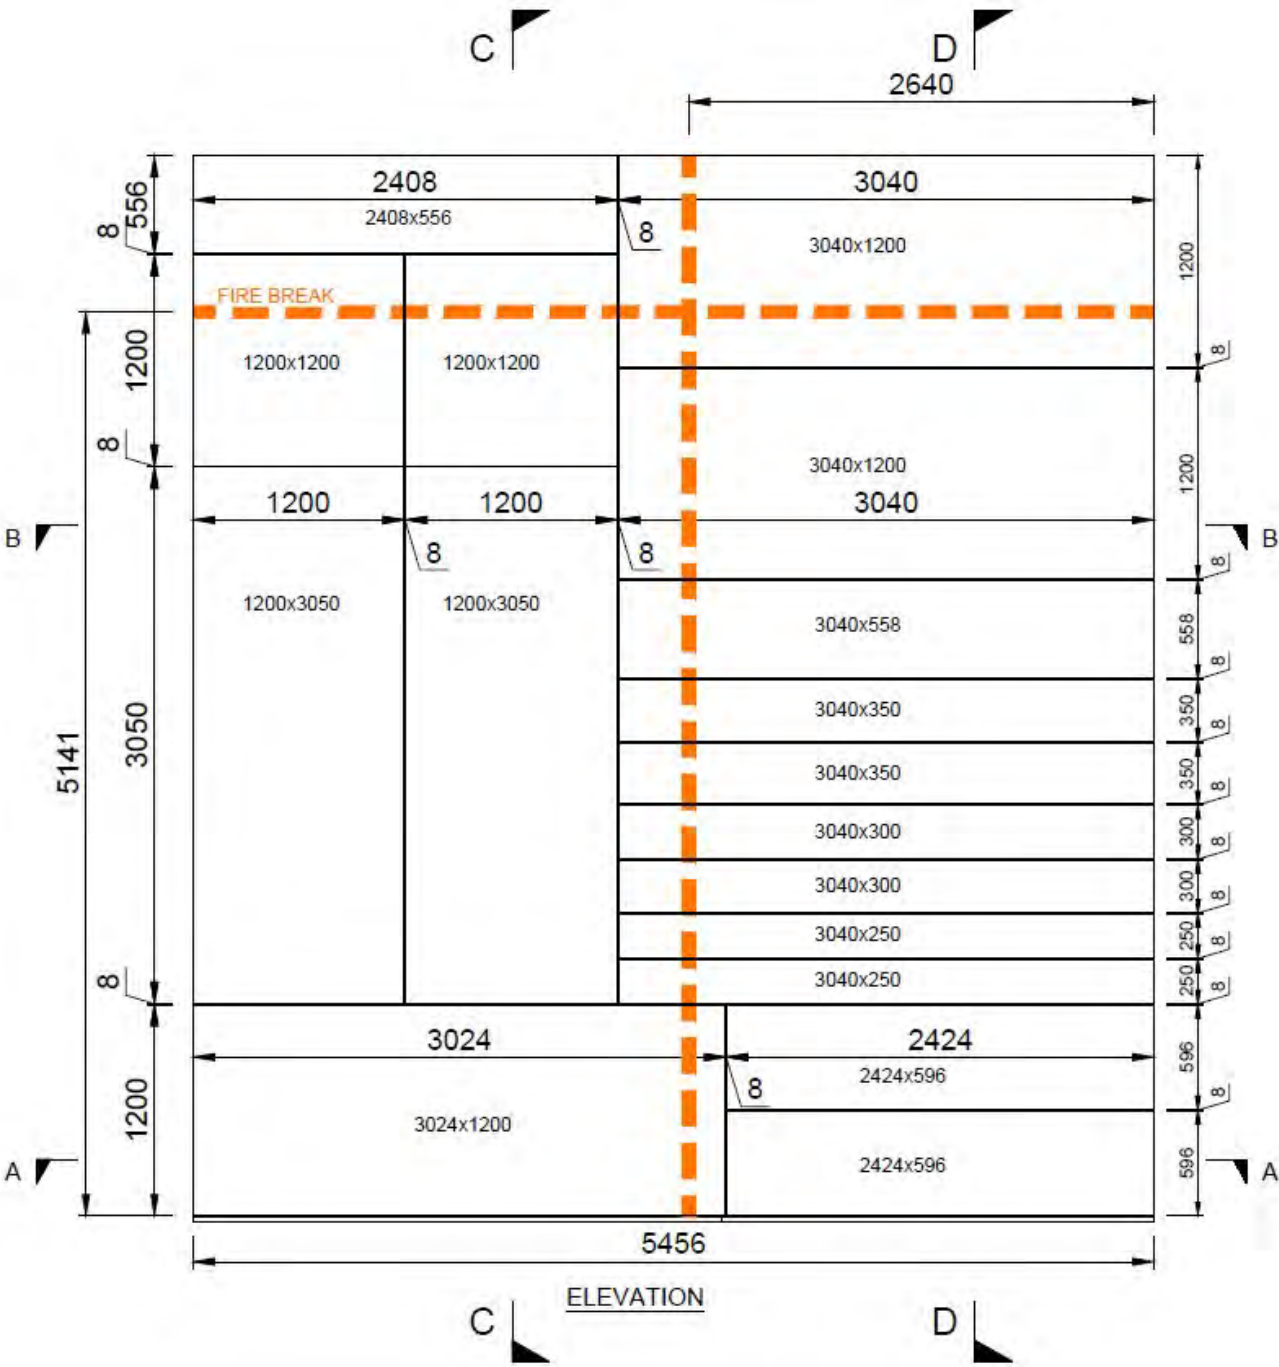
Elevation of cladding test sample showing location of cavity barriers
